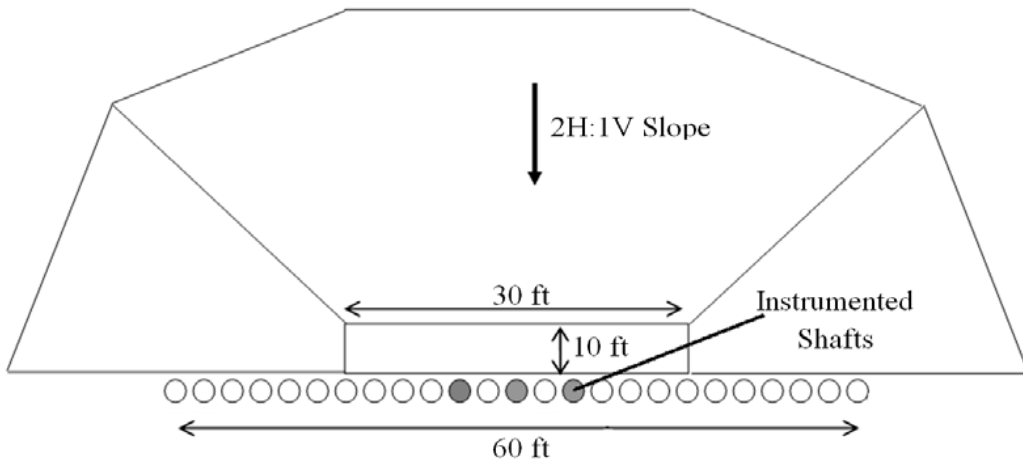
Plan view of the wall and location of the instrumented shafts
